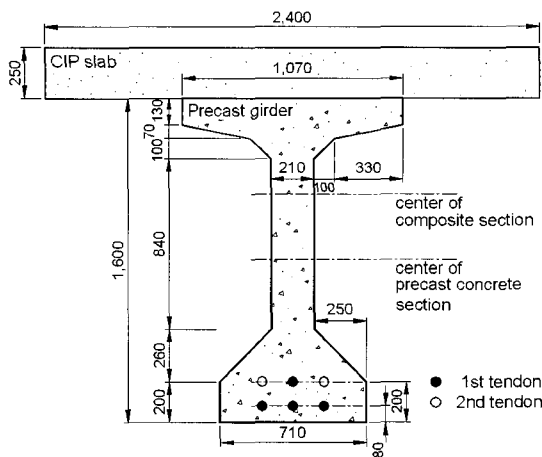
Example composite section with AASHTO type 5 precast concrete girder (unit mm)
